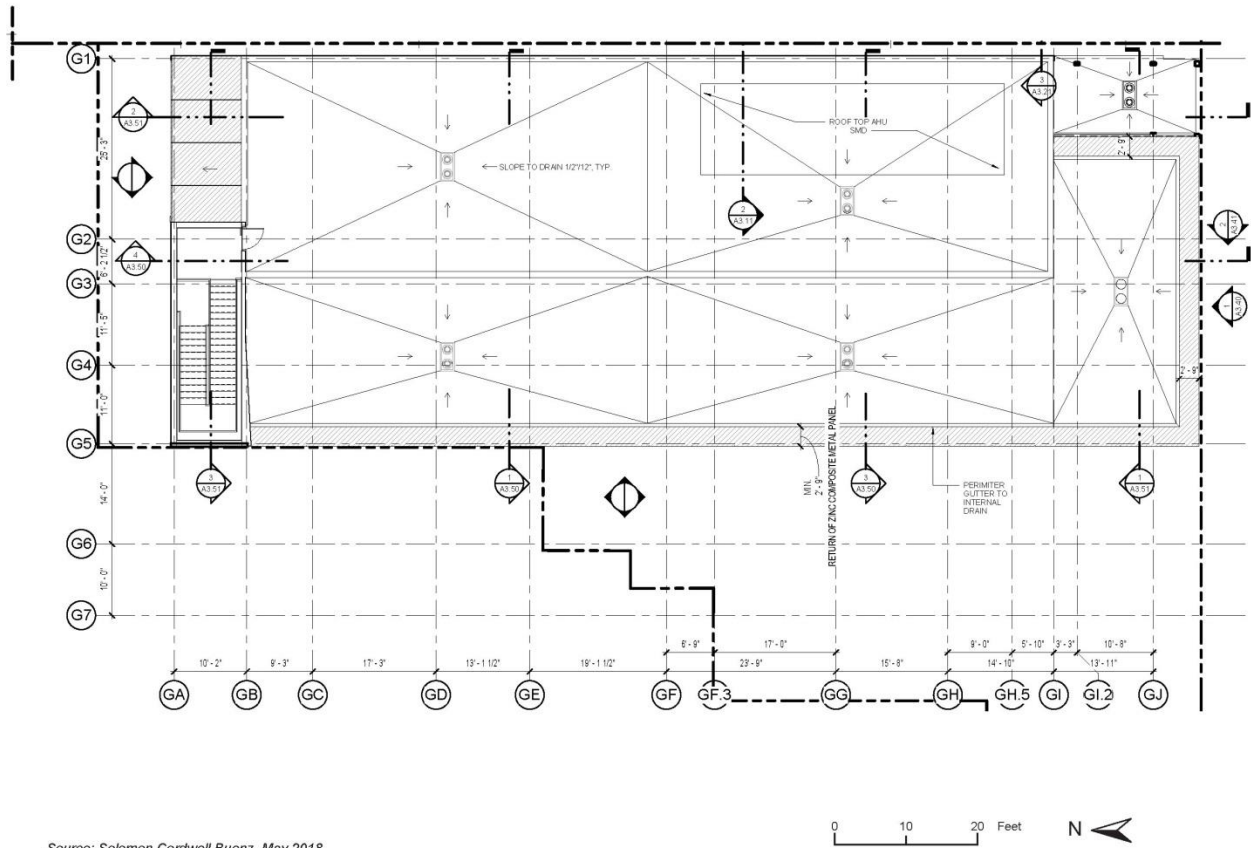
ACADEMIC BUILDING LEVEL 4 PLAN
